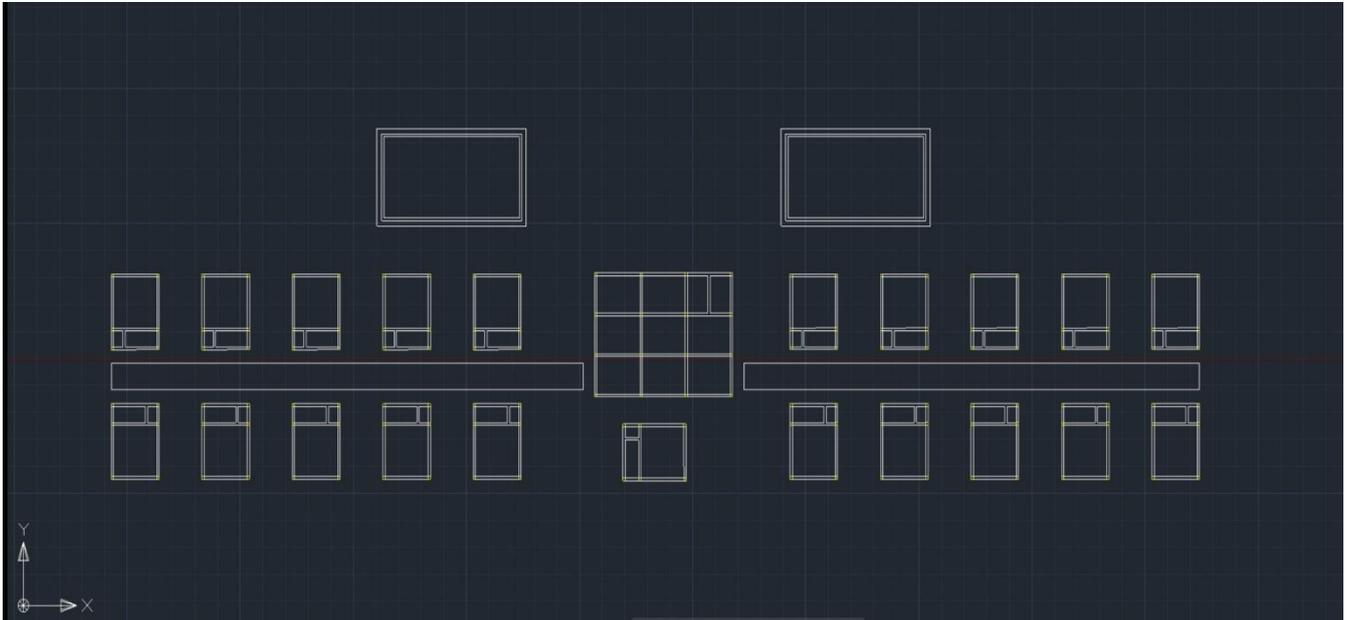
AutoCAD plan of Sustainable Resort ▲
